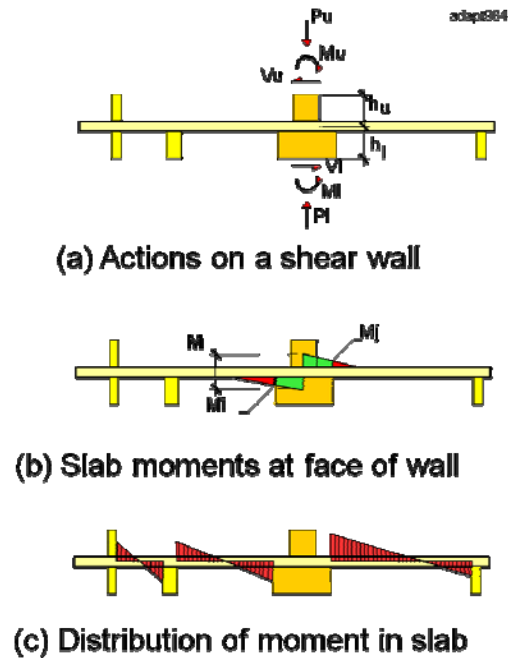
DISTRIBUTION OF COLUMN/WALL MOMENT IN SLAB
